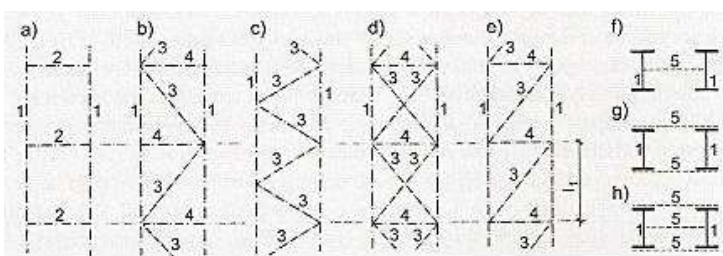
Geometry of battened and laced columns: 1- column chord, 2- batten plates, 3- diagonals, 4- studs, 5- battens and lacing
